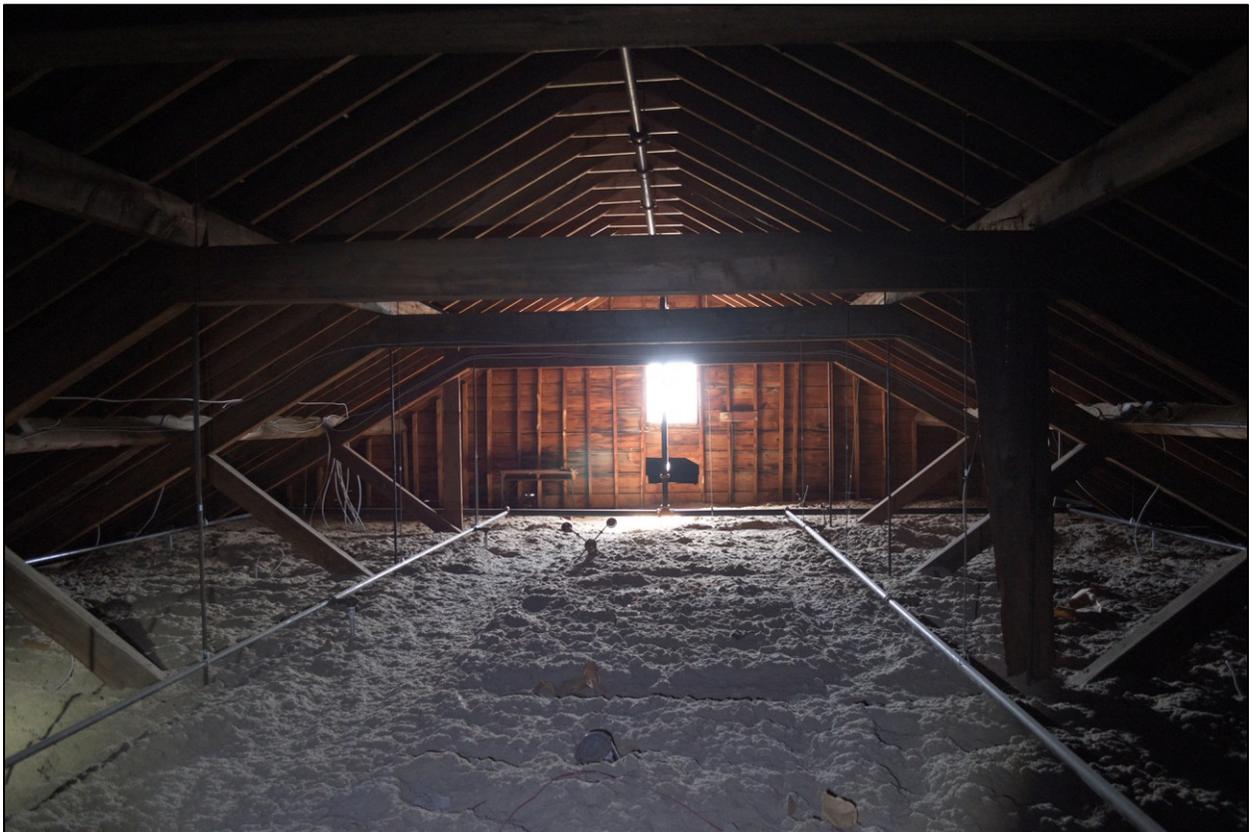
View across Deerfield Town House attic to the window at the south gable-end
